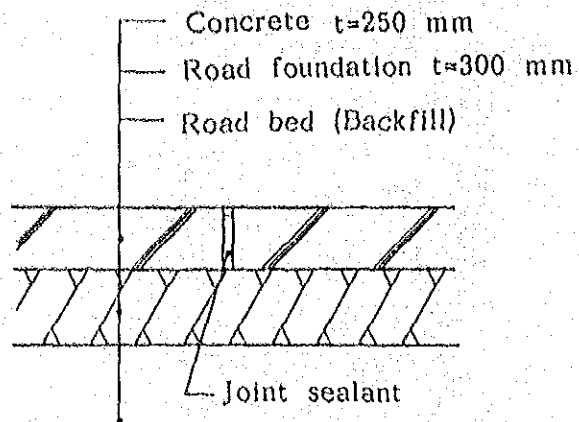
Standard Sectional Plan for the Concrete Road
